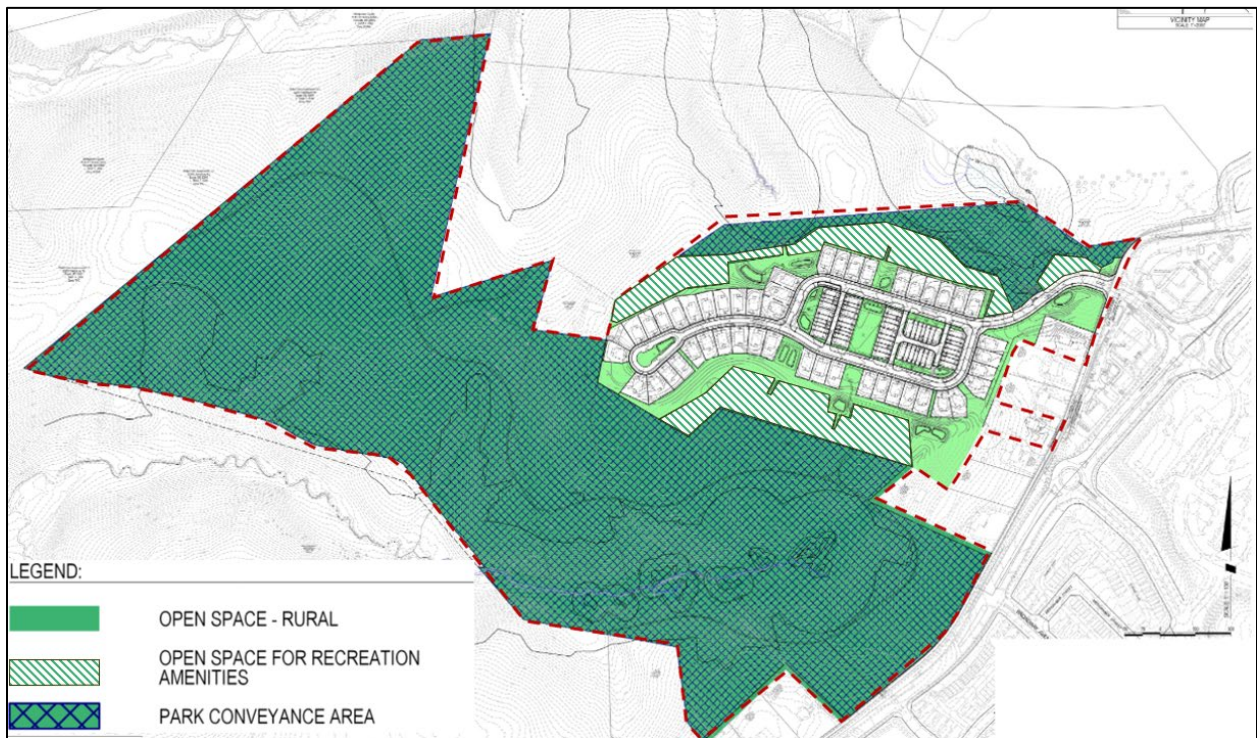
Proposed Rural Open Space and Parkland Conveyance (Site outlined in red, dashed line)
